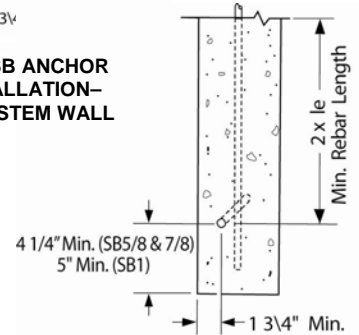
SB ANCHOR BOLT INSTALLATION—END OF STEM WALL
